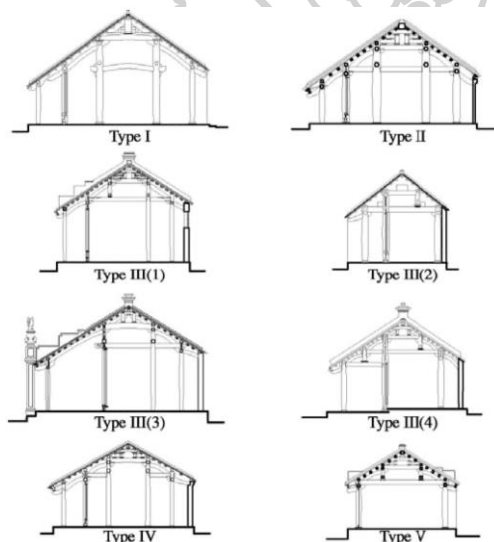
Some typical sections of the wooden frame system in Northern Vietnam
